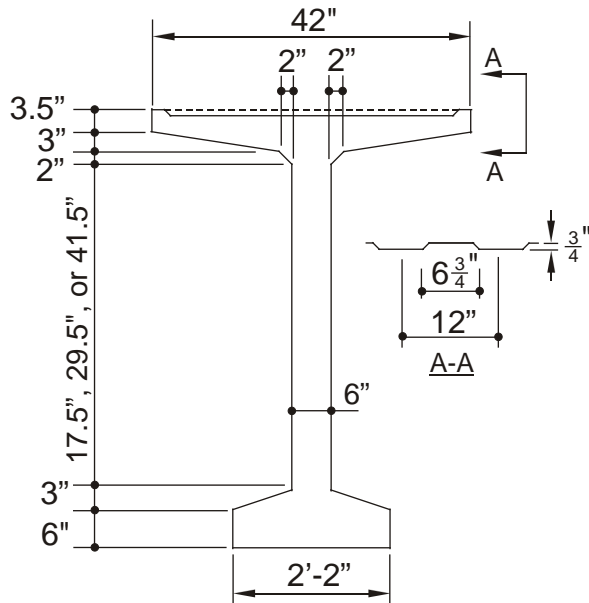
Proposed Girder: Stage 1 of Casting.
